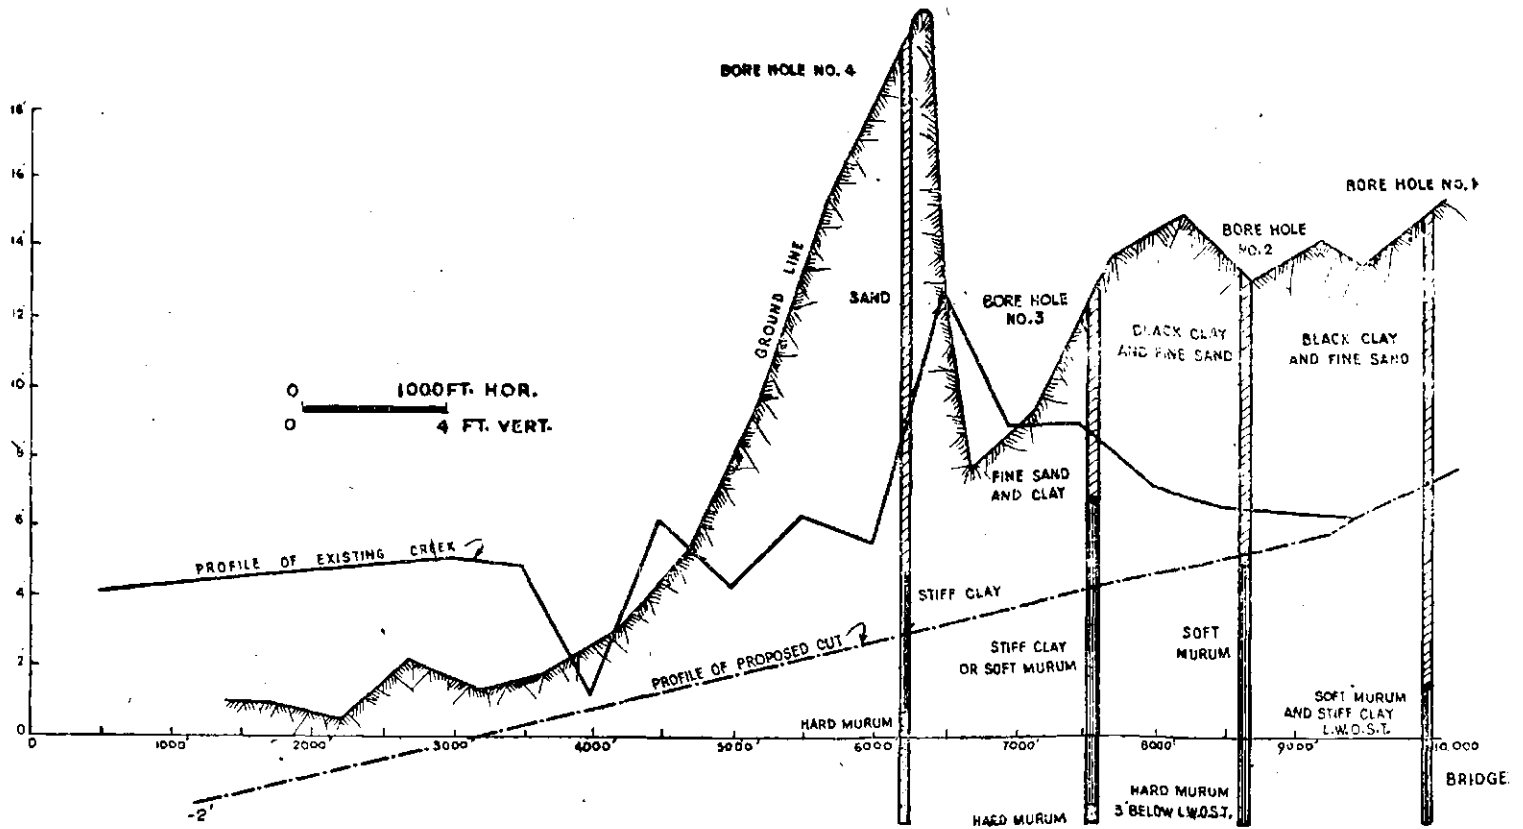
Plan showing profiles of ground, existing creek and proposed cut with positions of boreholes.
